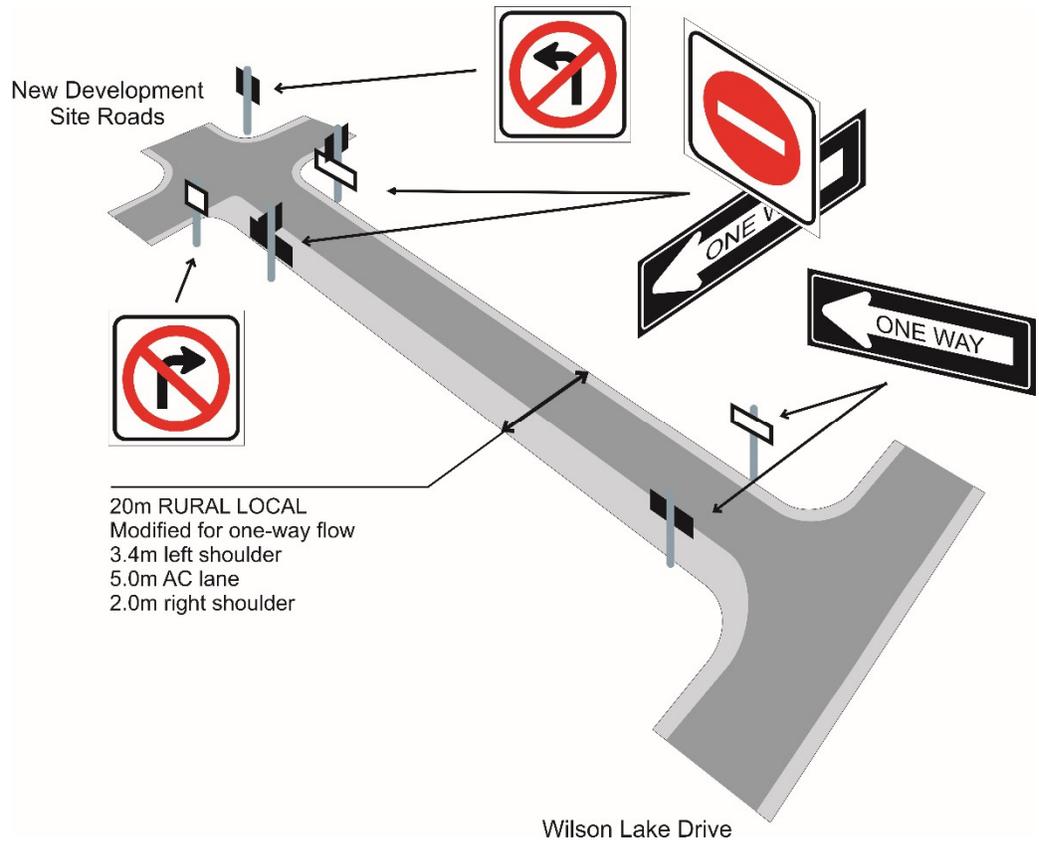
Proposed Layout of One-way Connection to Wilson Lake Drive
